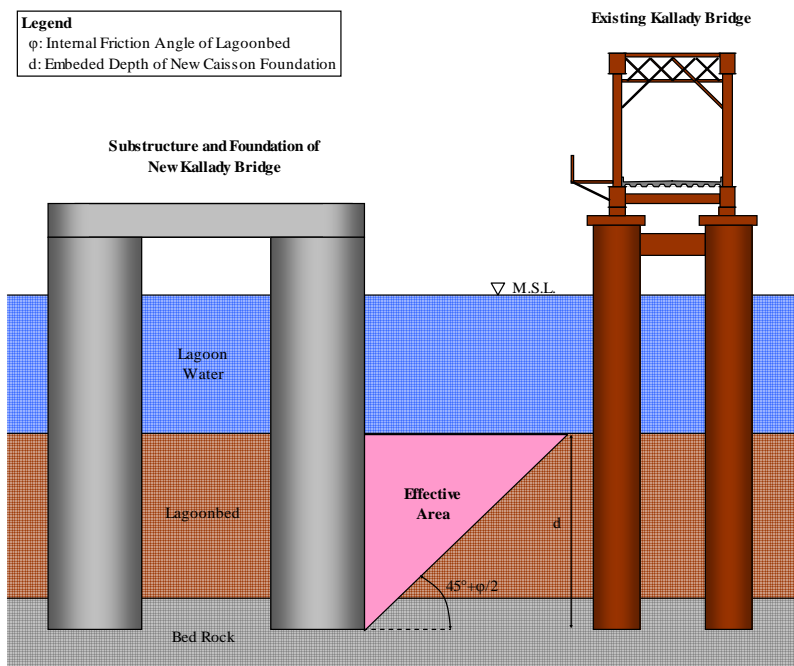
Effective Area of New Bridge Foundation Construction (Case of New Foundation being Caisson)
